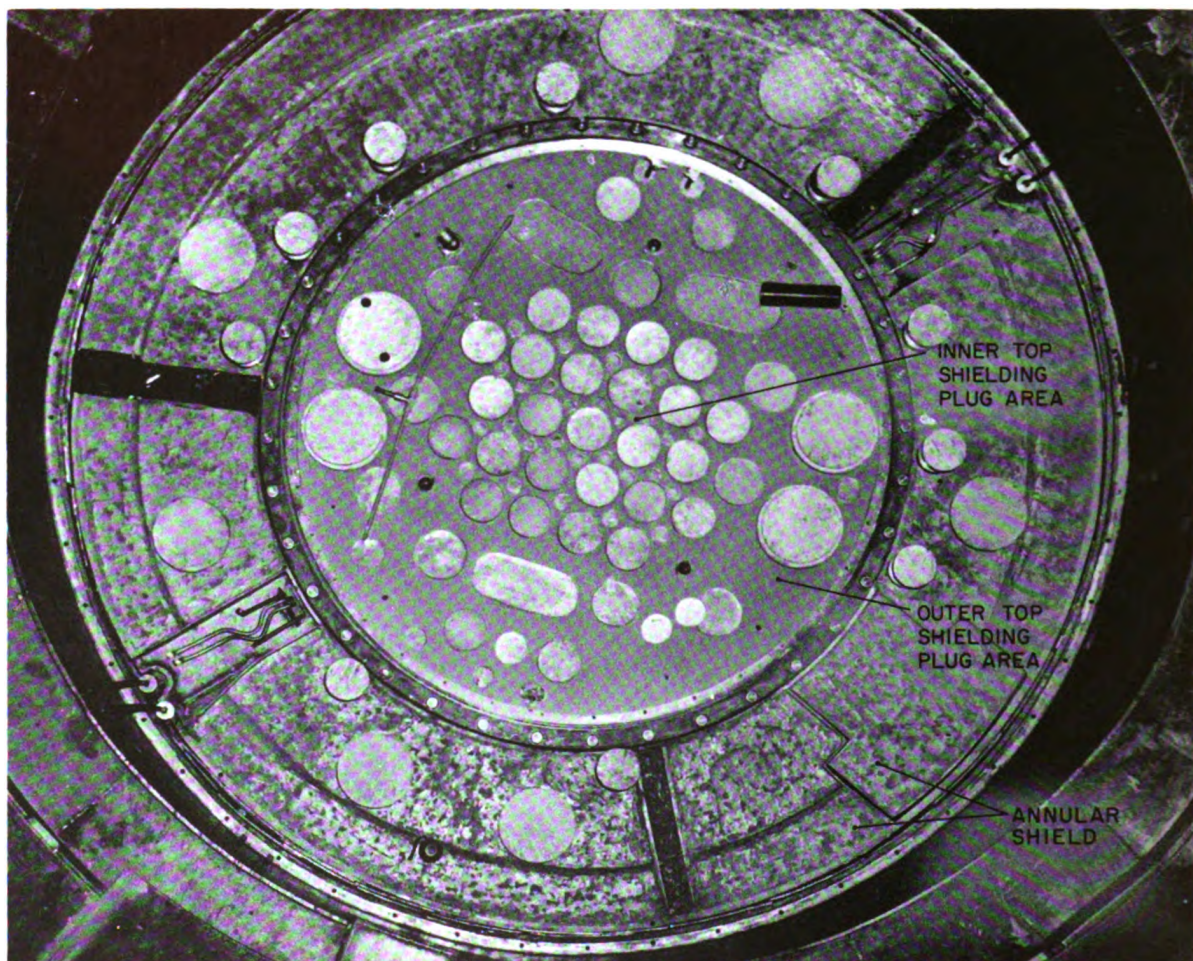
Reactor, after addition of cover plate and lead shielding.
